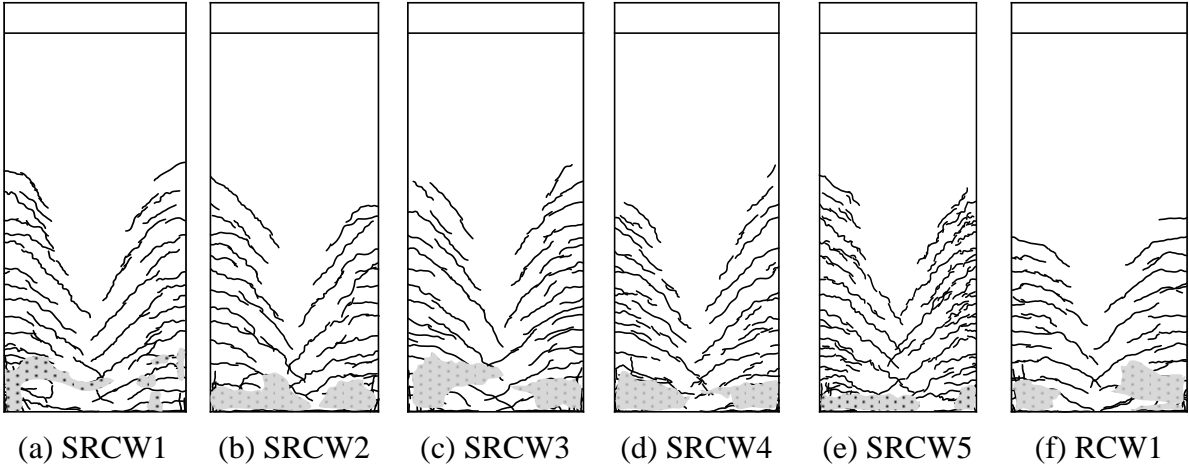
Concrete cracking and crushing patterns of wall specimens after testing.
